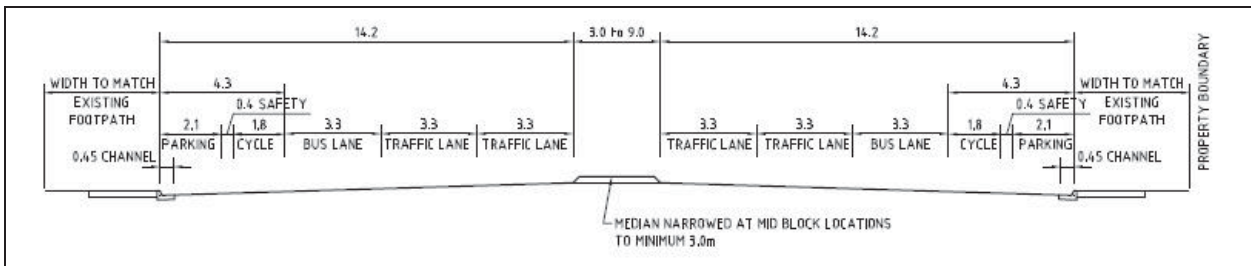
Nicklin Way typical cross-section with on-road parking
